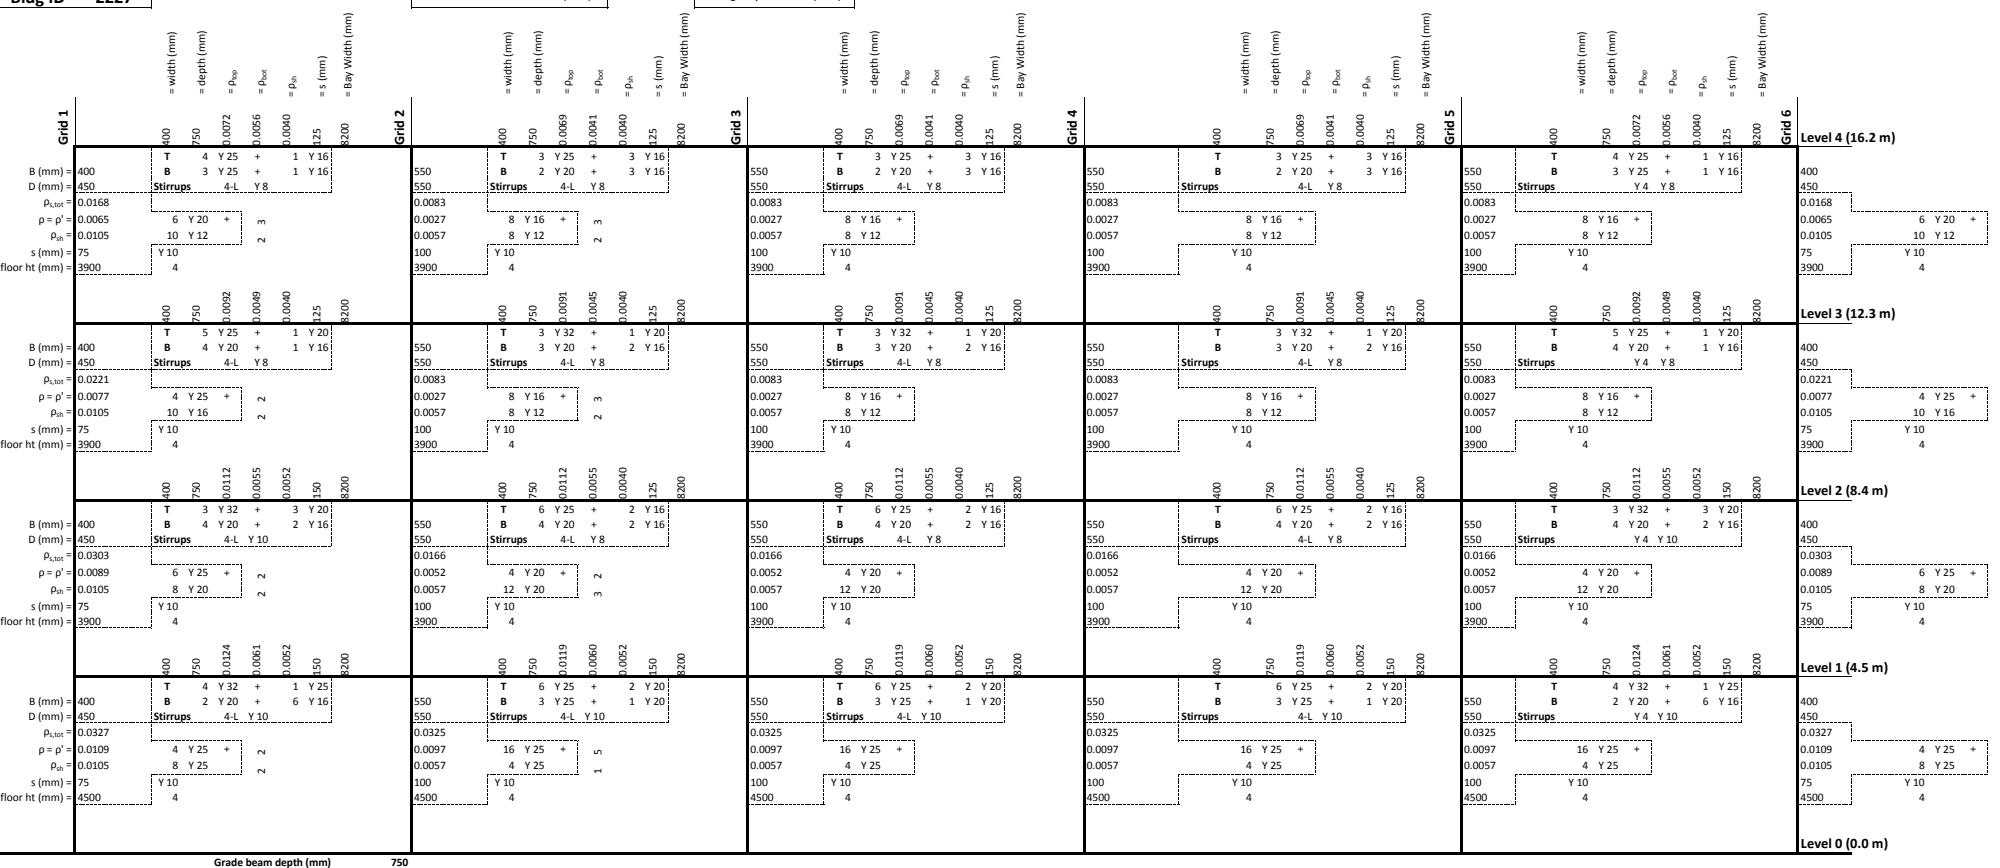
Provided reinforcement and modeling details for building ID 2227
